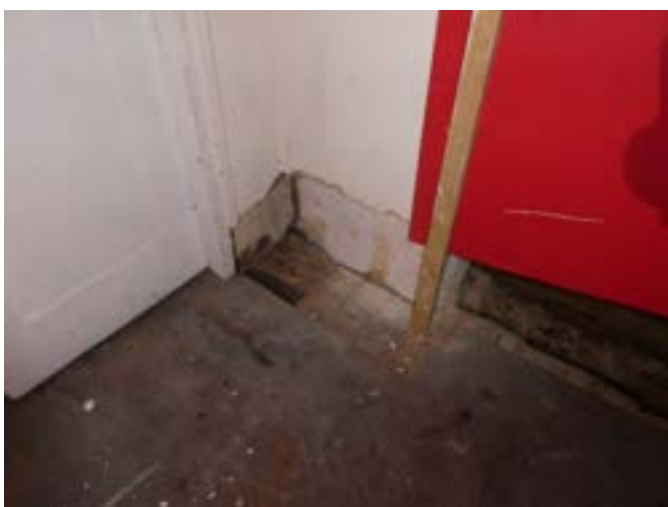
Showing the temporary propping within the north western stairwell. Noting unidentified blackspot mould to the plaster walls
